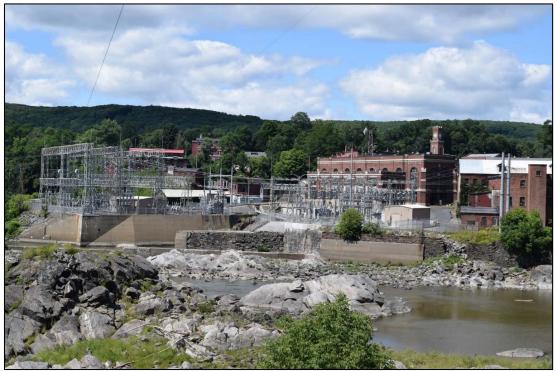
Bellows Falls Project, general view of Powerhouse, Tailrace, and Switchyards at south end of Bellows Falls Island, looking west from New Hampshire shoreline.
